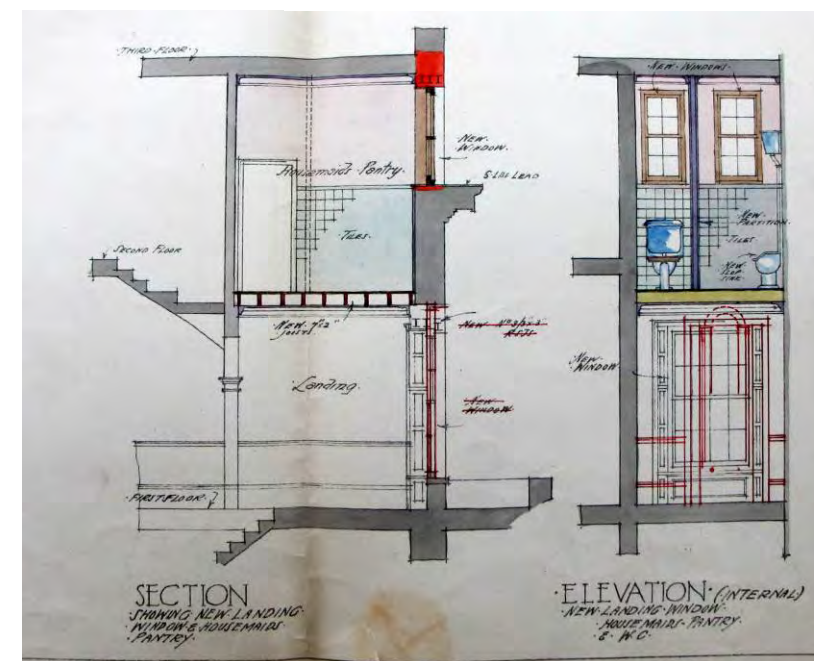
1925 – Proposed section showing alterations to the stairs/landing between the first and second floors.
